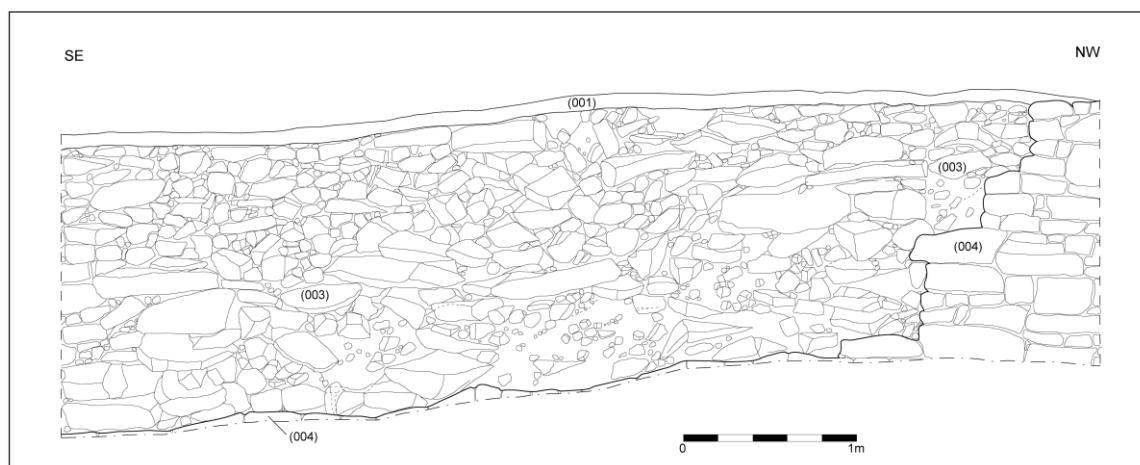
NE facing elevation of section of Moat Wall to NW of gateway, showing drystone rubble core (003) and later masonry facing (004)
